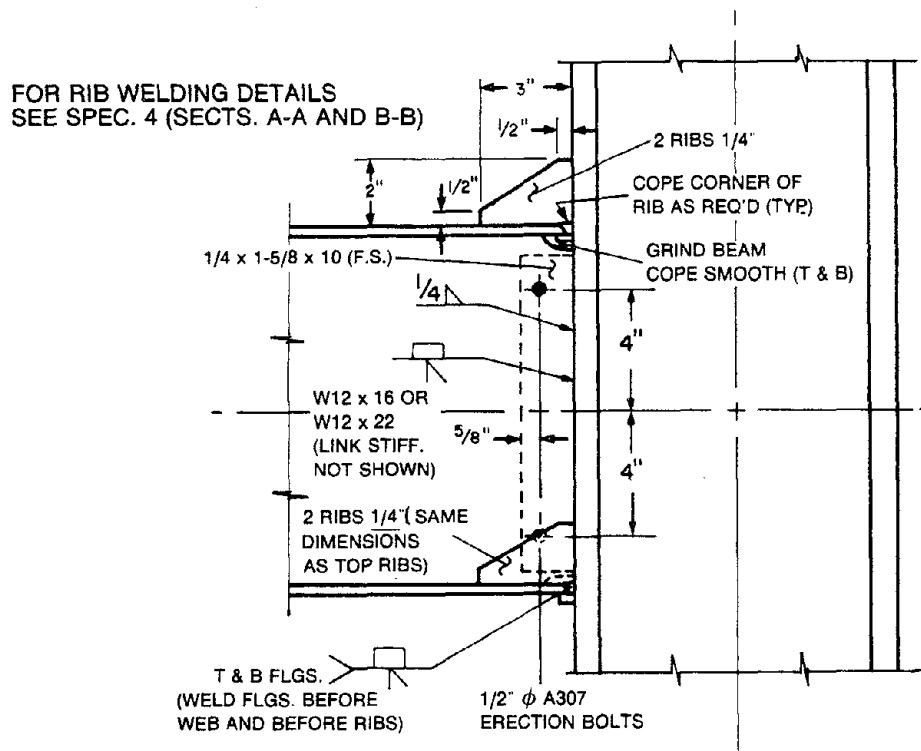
Link-Column Connection Details - Specimens 7 and 8
